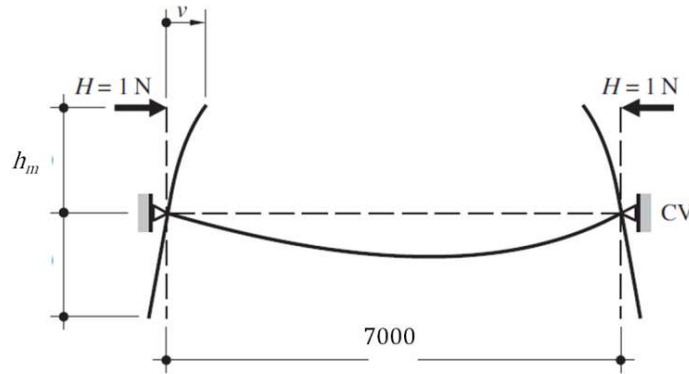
Bracing frame at the construction stage, adapted from [2] Figure 19.18
